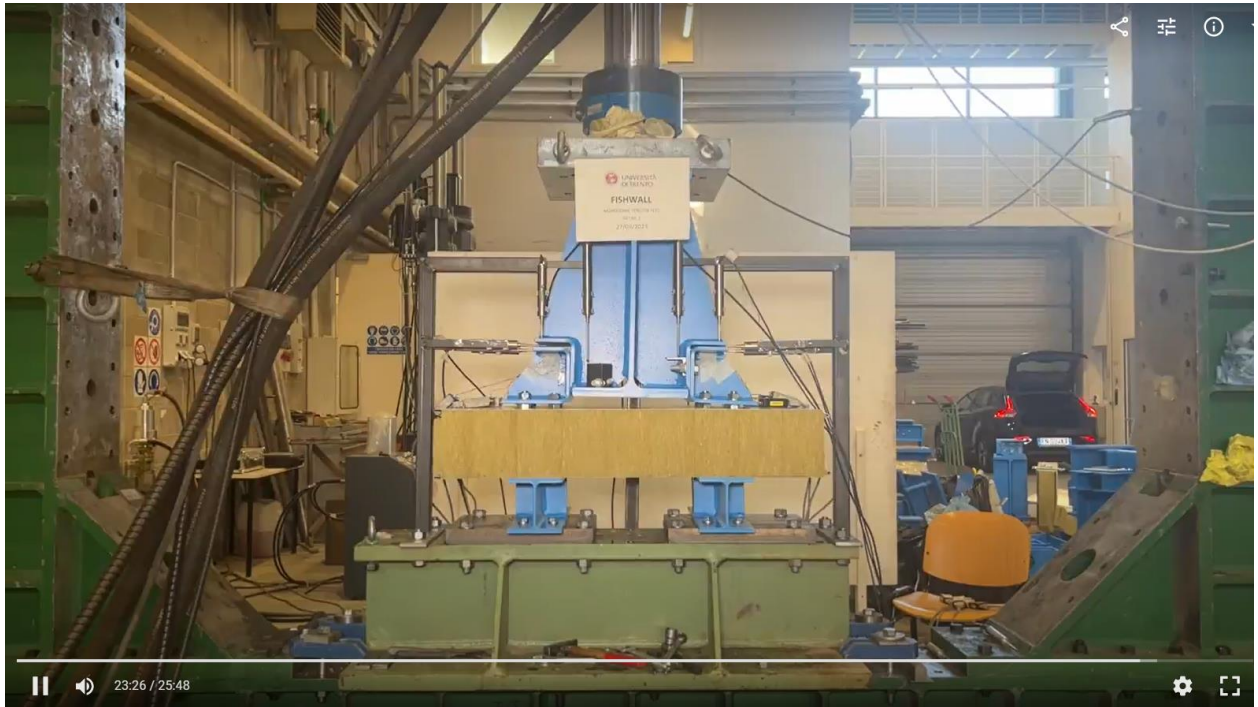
Detail 2 - tension test – deformation at 23 minutes.
